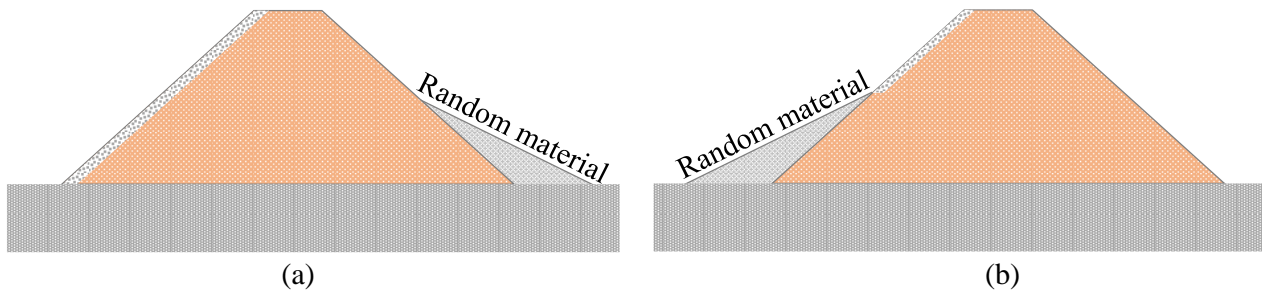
Examples of random fill material in exterior of dam: (a) counterweight and (b) slope protection reduction [16]
